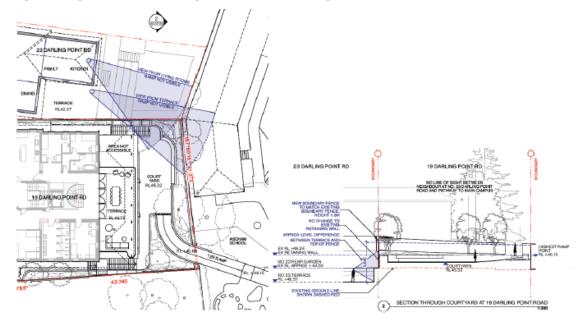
Sightlines between the adjoining property (No.23 Darling Rd) and No.19 Darling Point Road.
